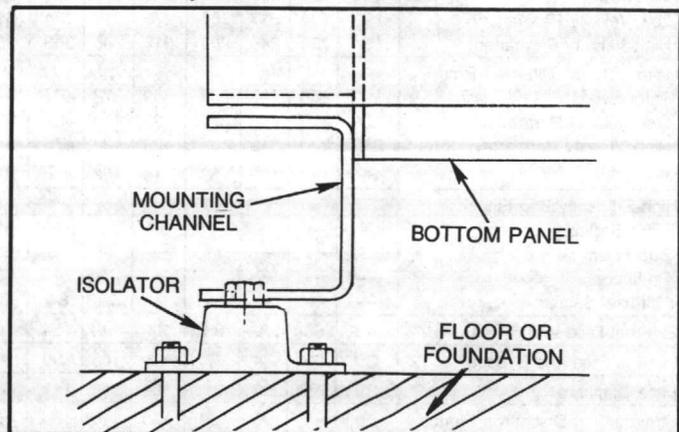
Anchoring The Unit For Sizes 35 to 63
